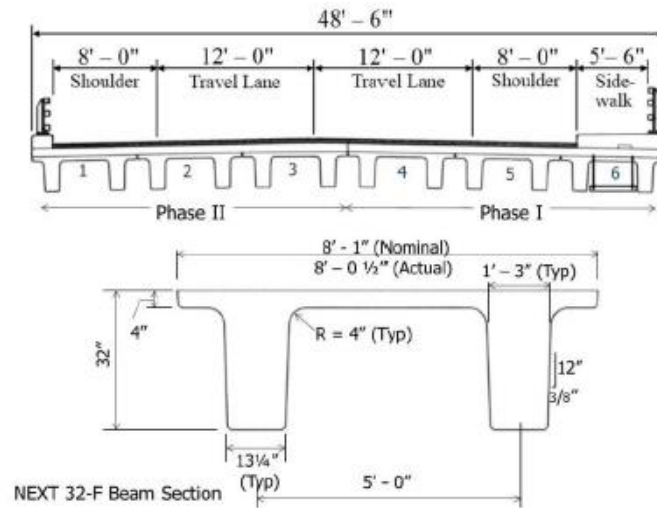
NEXT 32-F Dimensions and Bridge Cross Section (Bahjat et al., 2014)
